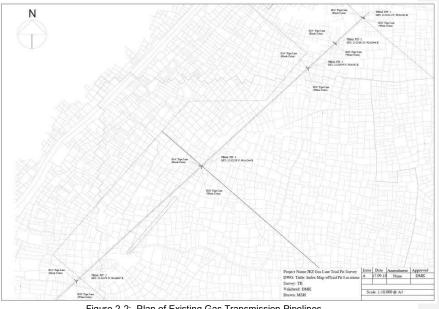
Plan of Existing Gas Transmission Pipelines
